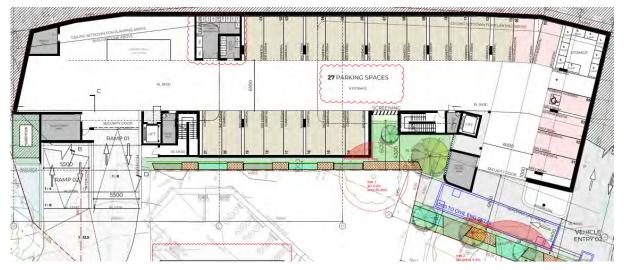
Parking layout within basement level 1 City of Ryde Local Planning Panel - 10 September 2020
